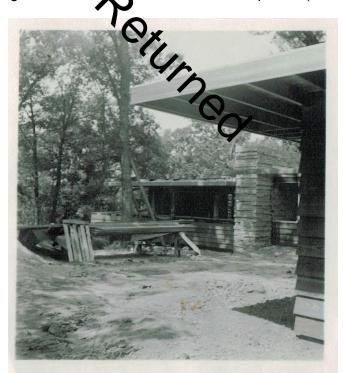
Figure D: House under construction, view north from corner of bedroom wing toward family wing (1942)
